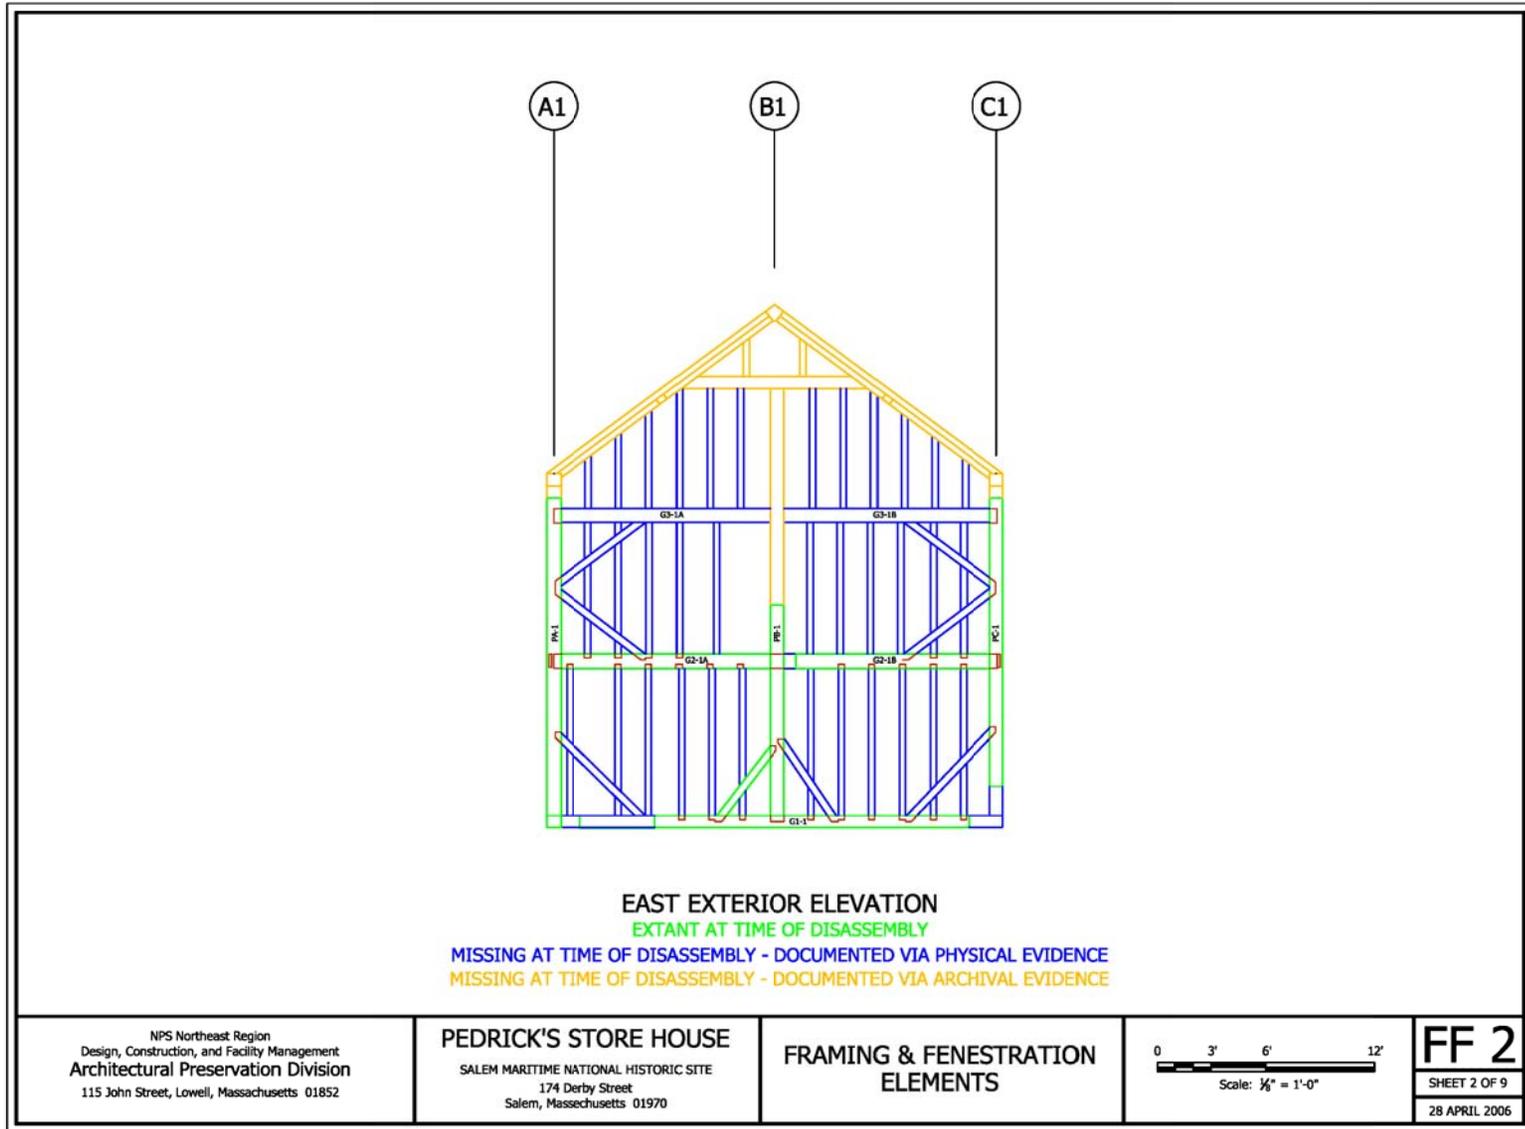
Measured drawing of framing and fenestration elements: East exterior elevation.
